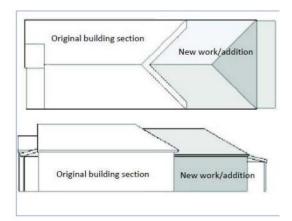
(b) - Alterations and additions to be smaller in scale and length than the existing building. (i)
